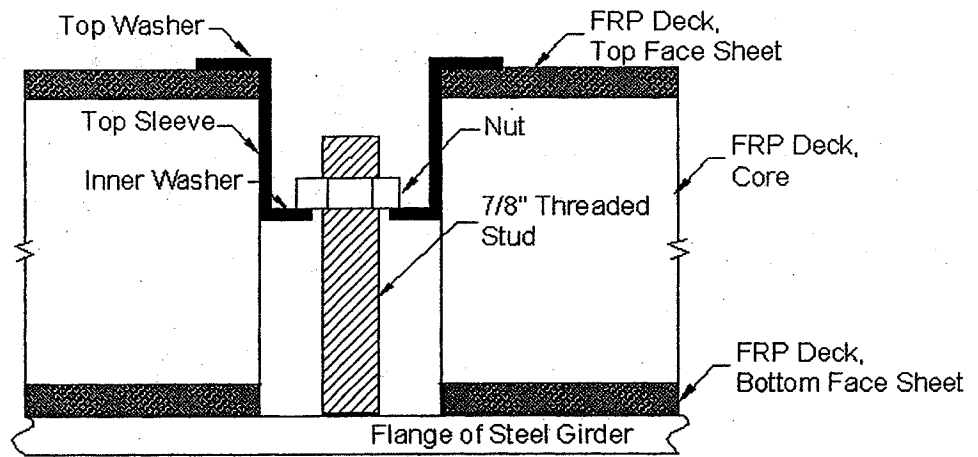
Panel Connected to Girder with Type 3 Connection
